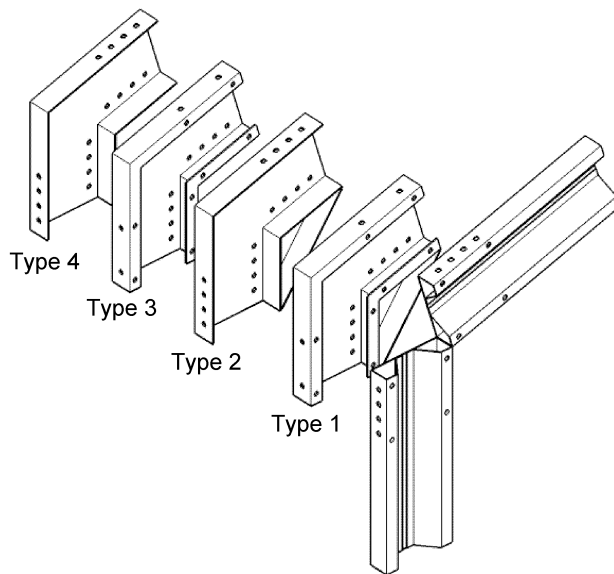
Eaves joints for PRY sections after Kwon et al. (2006)
